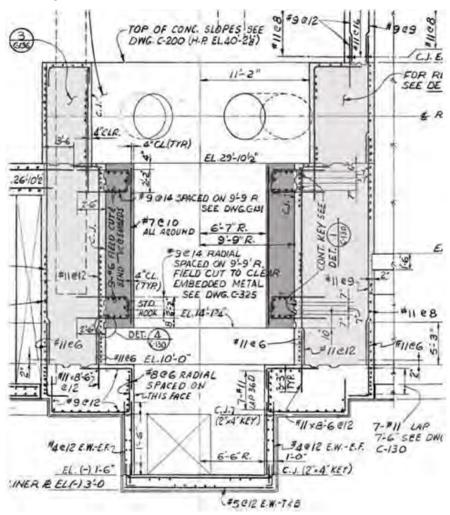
Elevation View of the PSW and BSW
